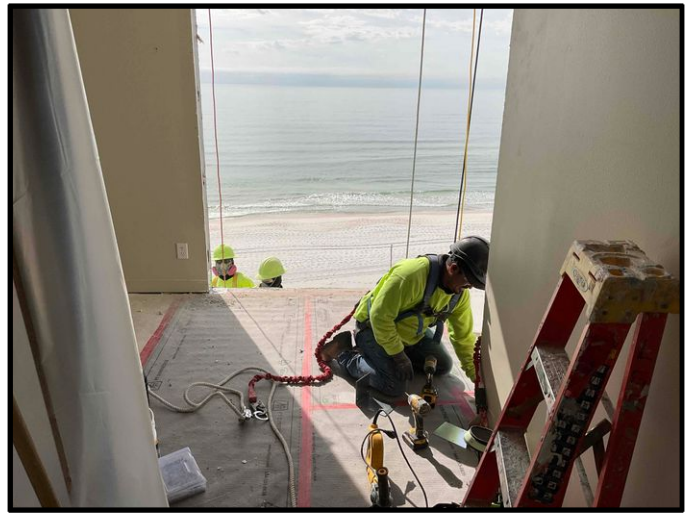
South Elevation - Bedroom Window - Unit No. 700 - View of rough opening preparation - Work in Progress.
